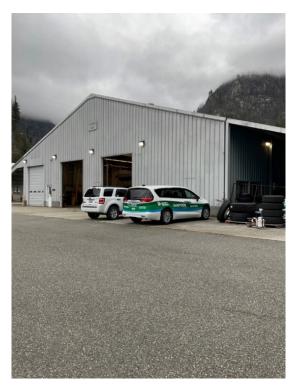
Gorge Switchyard and Maintenance Yard – typical wall packs (exterior lighting).
